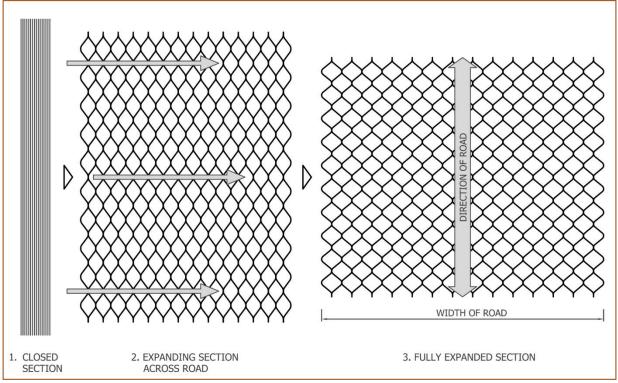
LAYOUT & DIRECTION OF SECTIONS & CELLS
